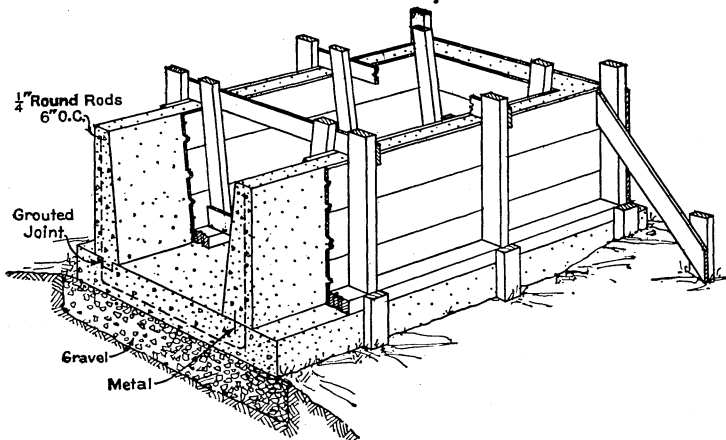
Construction of a rectangular trough on a sub-base. Water-tight joints made with a 6-inch strip of galvanized metal or grouted tongue and groove.
